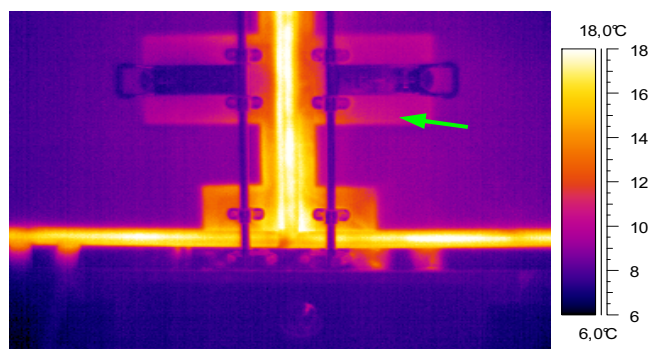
Thermovision photo of the door leaf with strengthening for fastening the door closure (green arrow) [1]
